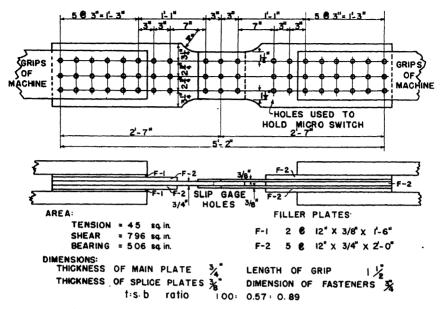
Details of Fatigue Specimens for Main Series of Tests.
